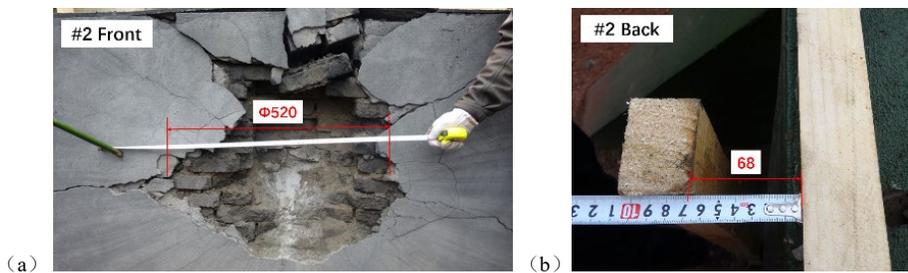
Impact fracture of back surface sprayed polyurea masonry walls (a) Front surface ; (b) Back surface
